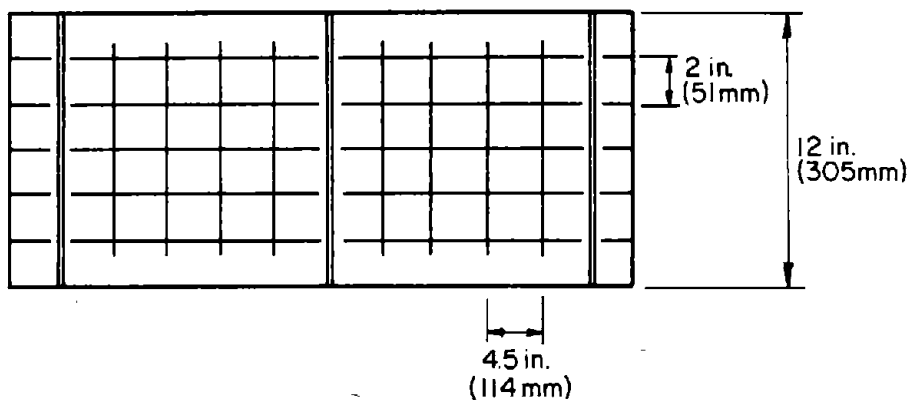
LINING DIMENSIONS AND REINFORCEMENT ARRANGEMENT FOR SEGMENTED LININGS
